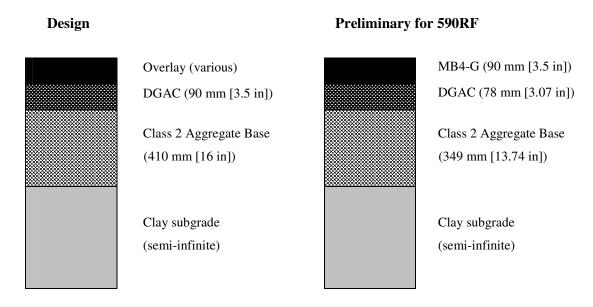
Pavement design for the Reflective Cracking Study test track.
